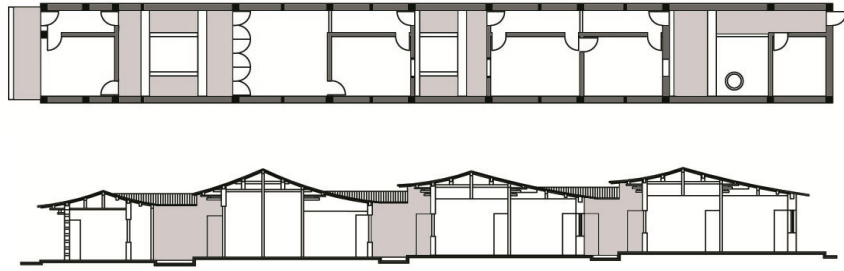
The plan and section of shoujinliao building, Quanzhou
